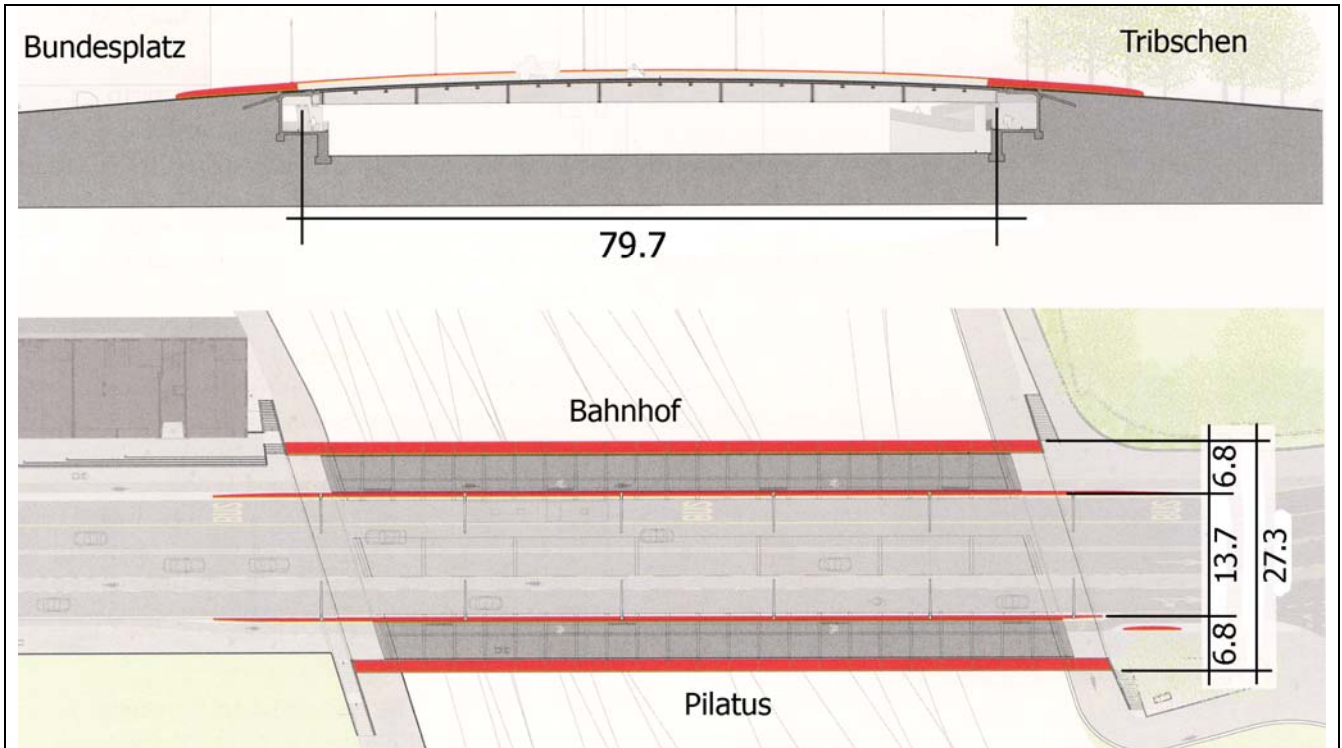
Langensand Bridge, plan view and longitudinal section. Dimensions: meter. (Underlying graphics: TU Bruno Zwahlen Mayr, courtesy tec21, the Journal of the Swiss Association for Engineers and Architects.)
